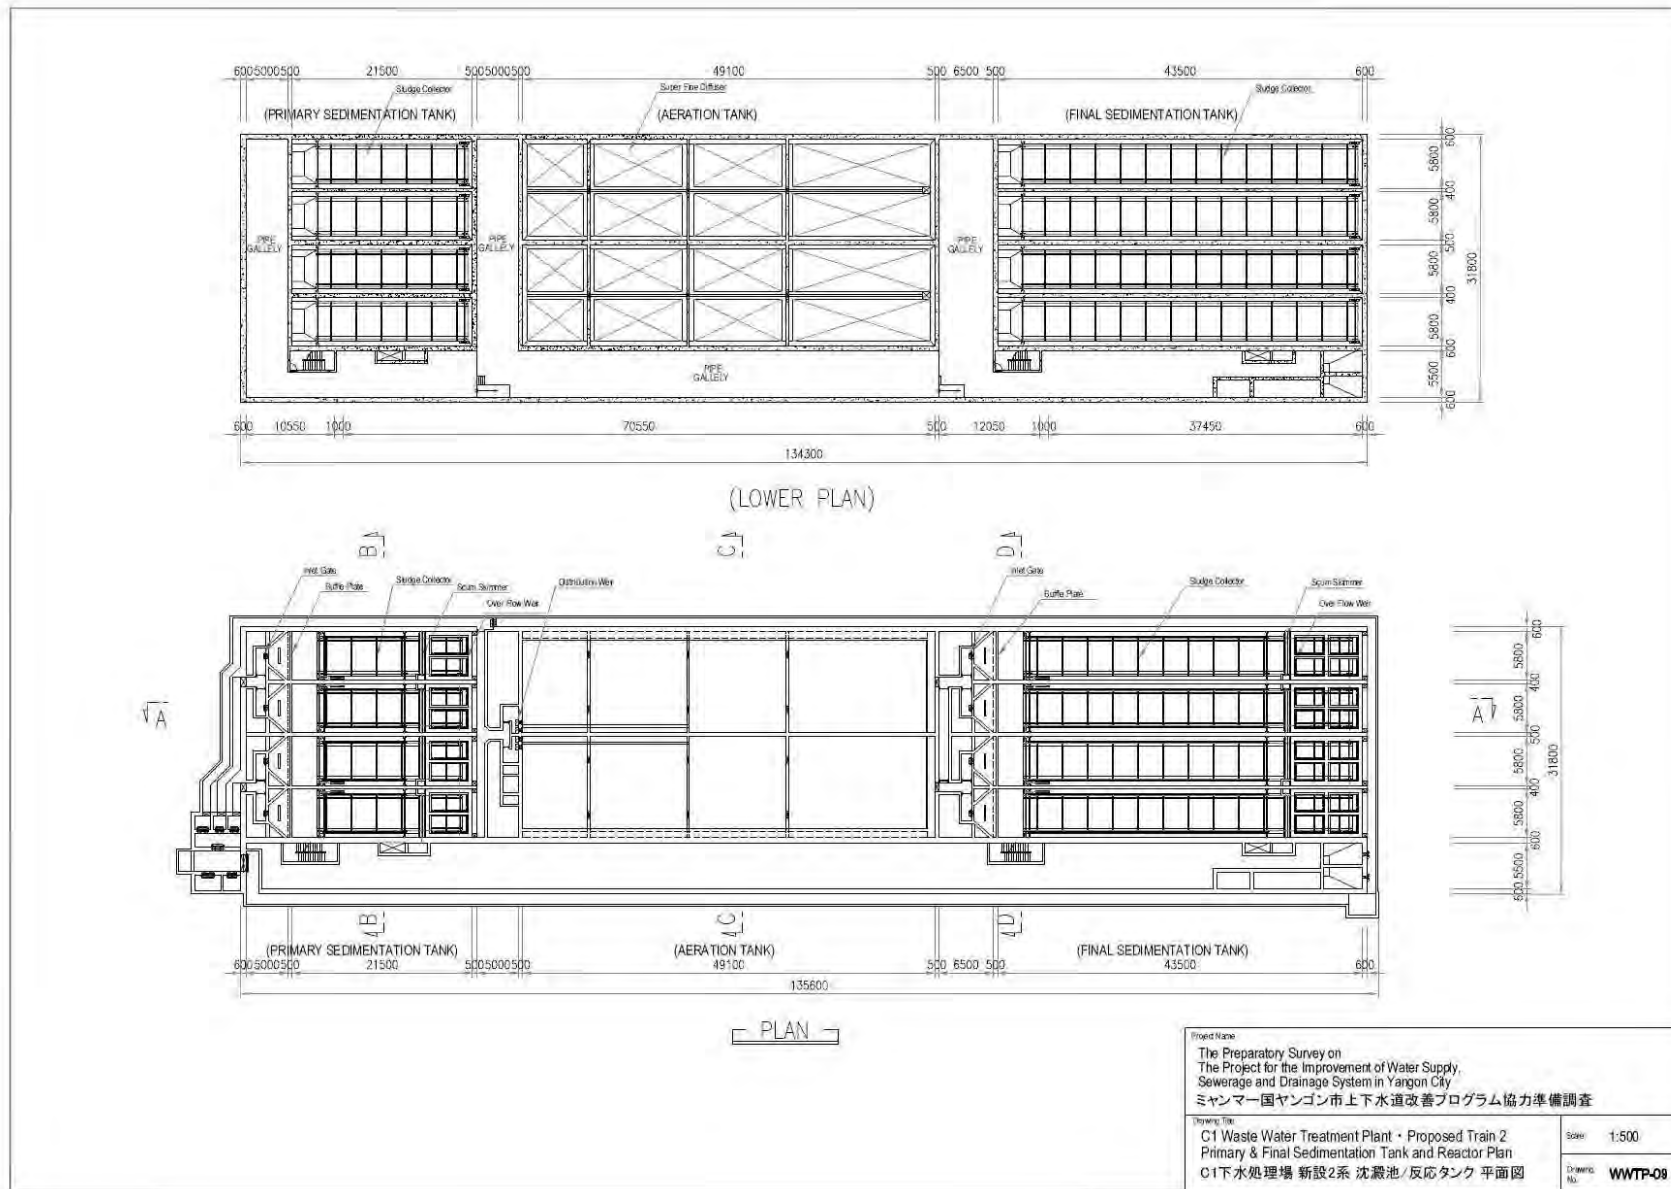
Primary/Final Sedimentation & Aeration Tanks, Plan (Expansion Line)
